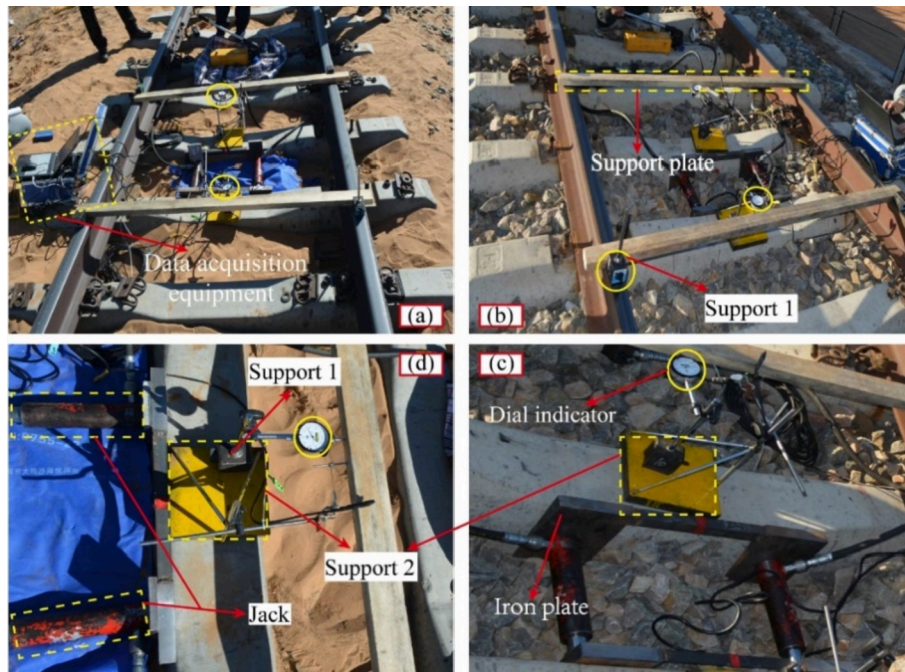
Setup for longitudinal resistance test: (a) Sandy section, (b) Clean section, (c) Clean section equipment installation detail, (d) Sandy section equipment installation detail.
